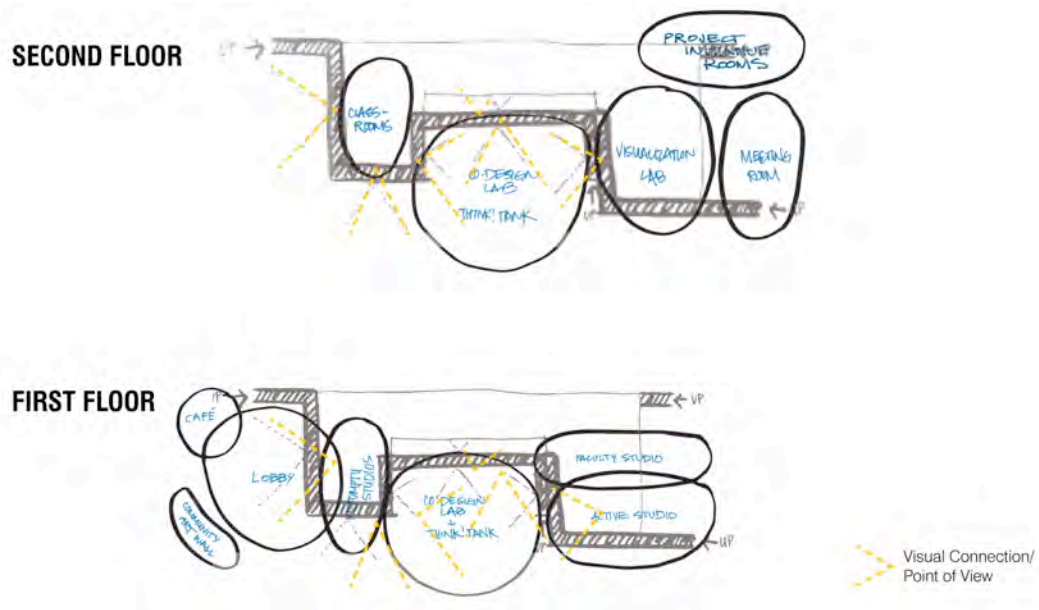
First floor and second floor catwalk experience to support visual connectivity
